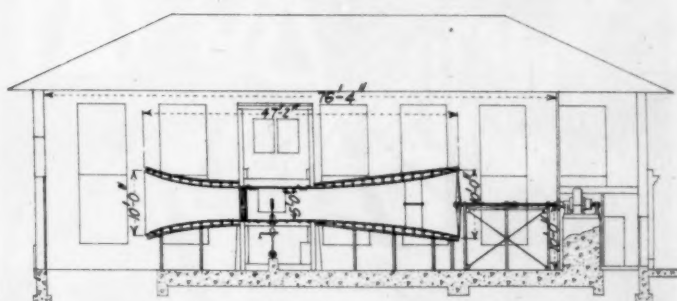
LONGITUDINAL SECTION OF THE WIND-TUNNEL BUILDING AND THE TUNNEL
